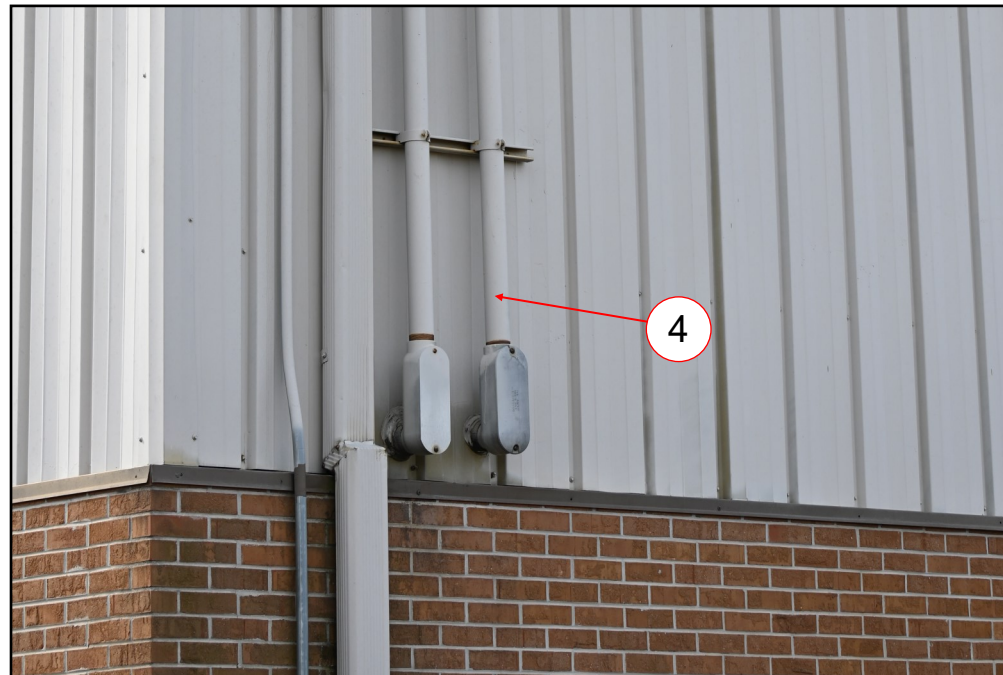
Twin Incoming power feeder conduits penetration point at existing FBO Terminal Building
